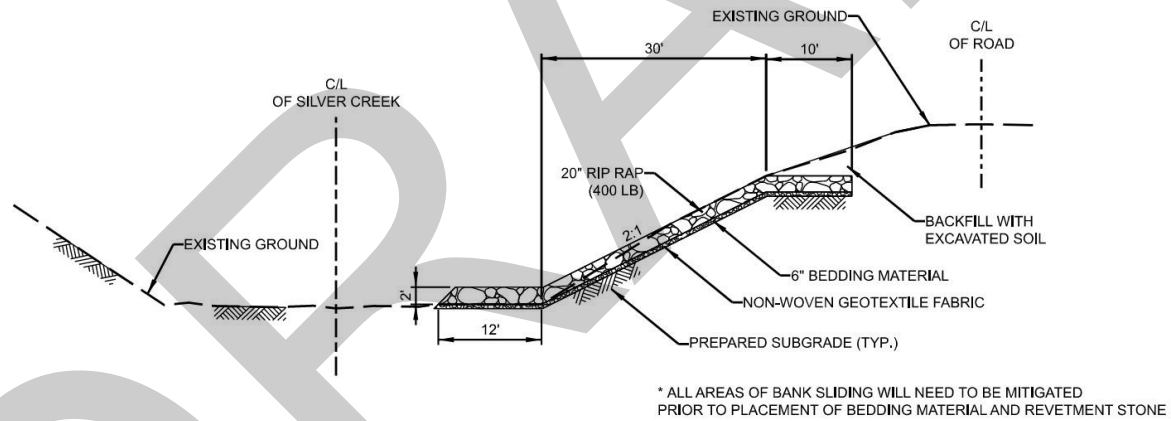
Typical plan section of Streambank revetment placement, not specific to this project, not to scale.
